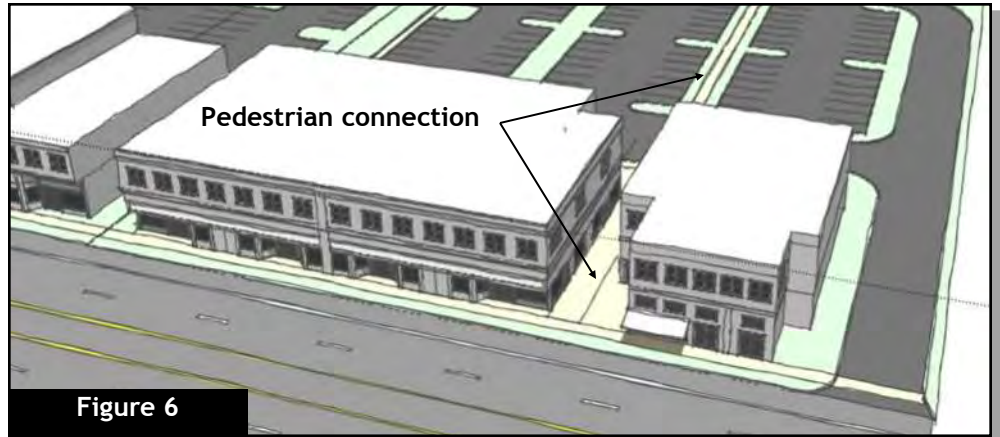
depicts a single, large property on which two structures are built, each sharing a parking area in the rear. This concept also provides a common pedestrian network and plaza space that connects each building entry with the common parking lot and the street.
